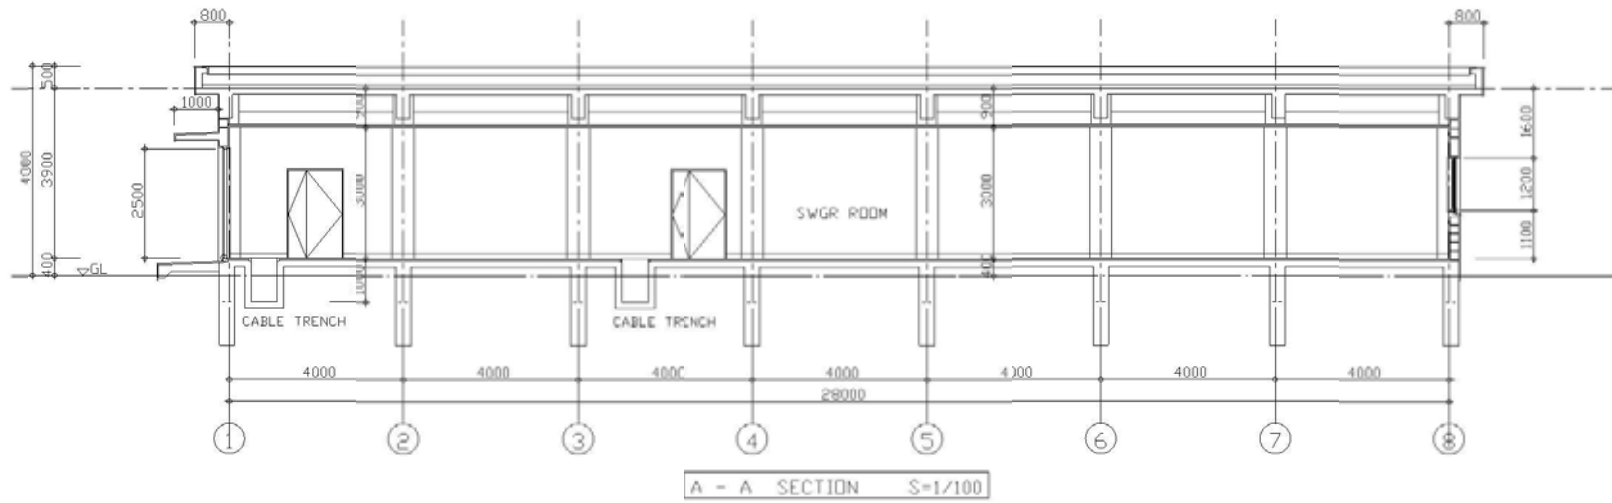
Sectional Plan of Mtoni Substation Control Building
